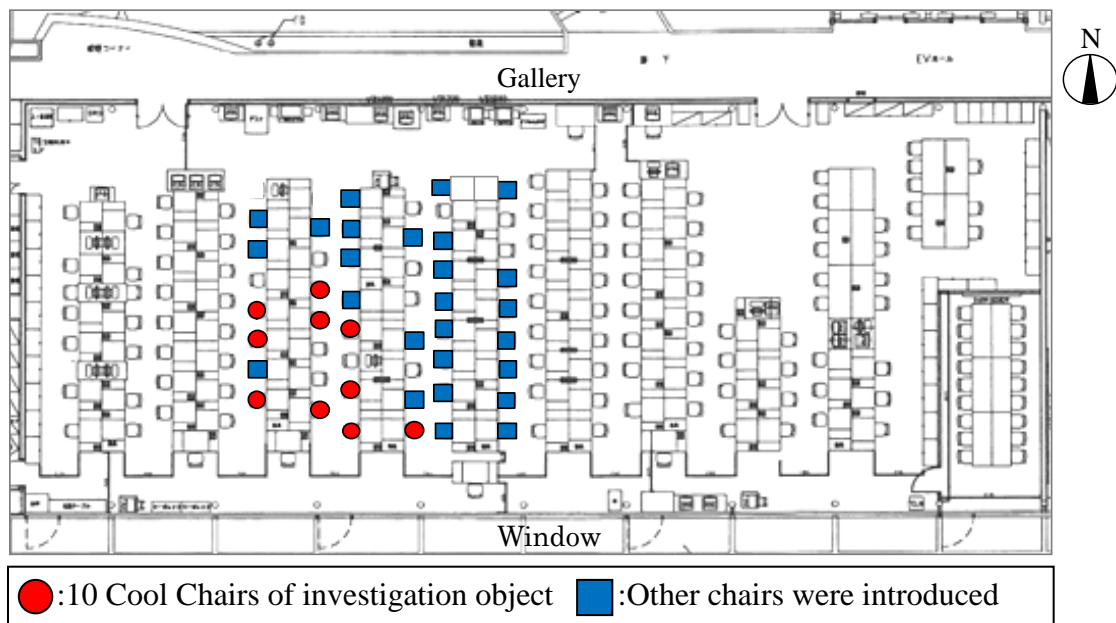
Third-floor plan and locations where Cool Chairs and other chairs were introduced
